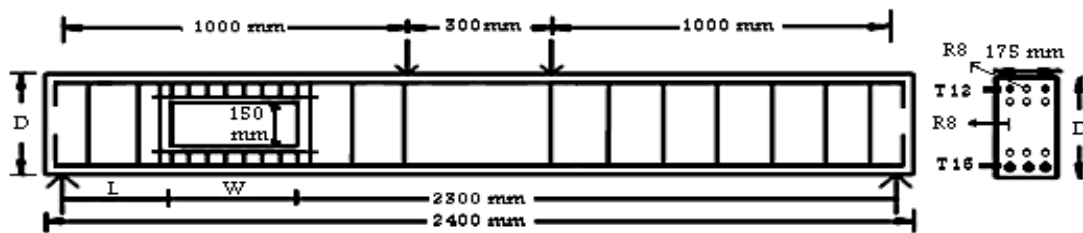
RC BEAMS DETAILS AND LOADING ARRANGEMENT
